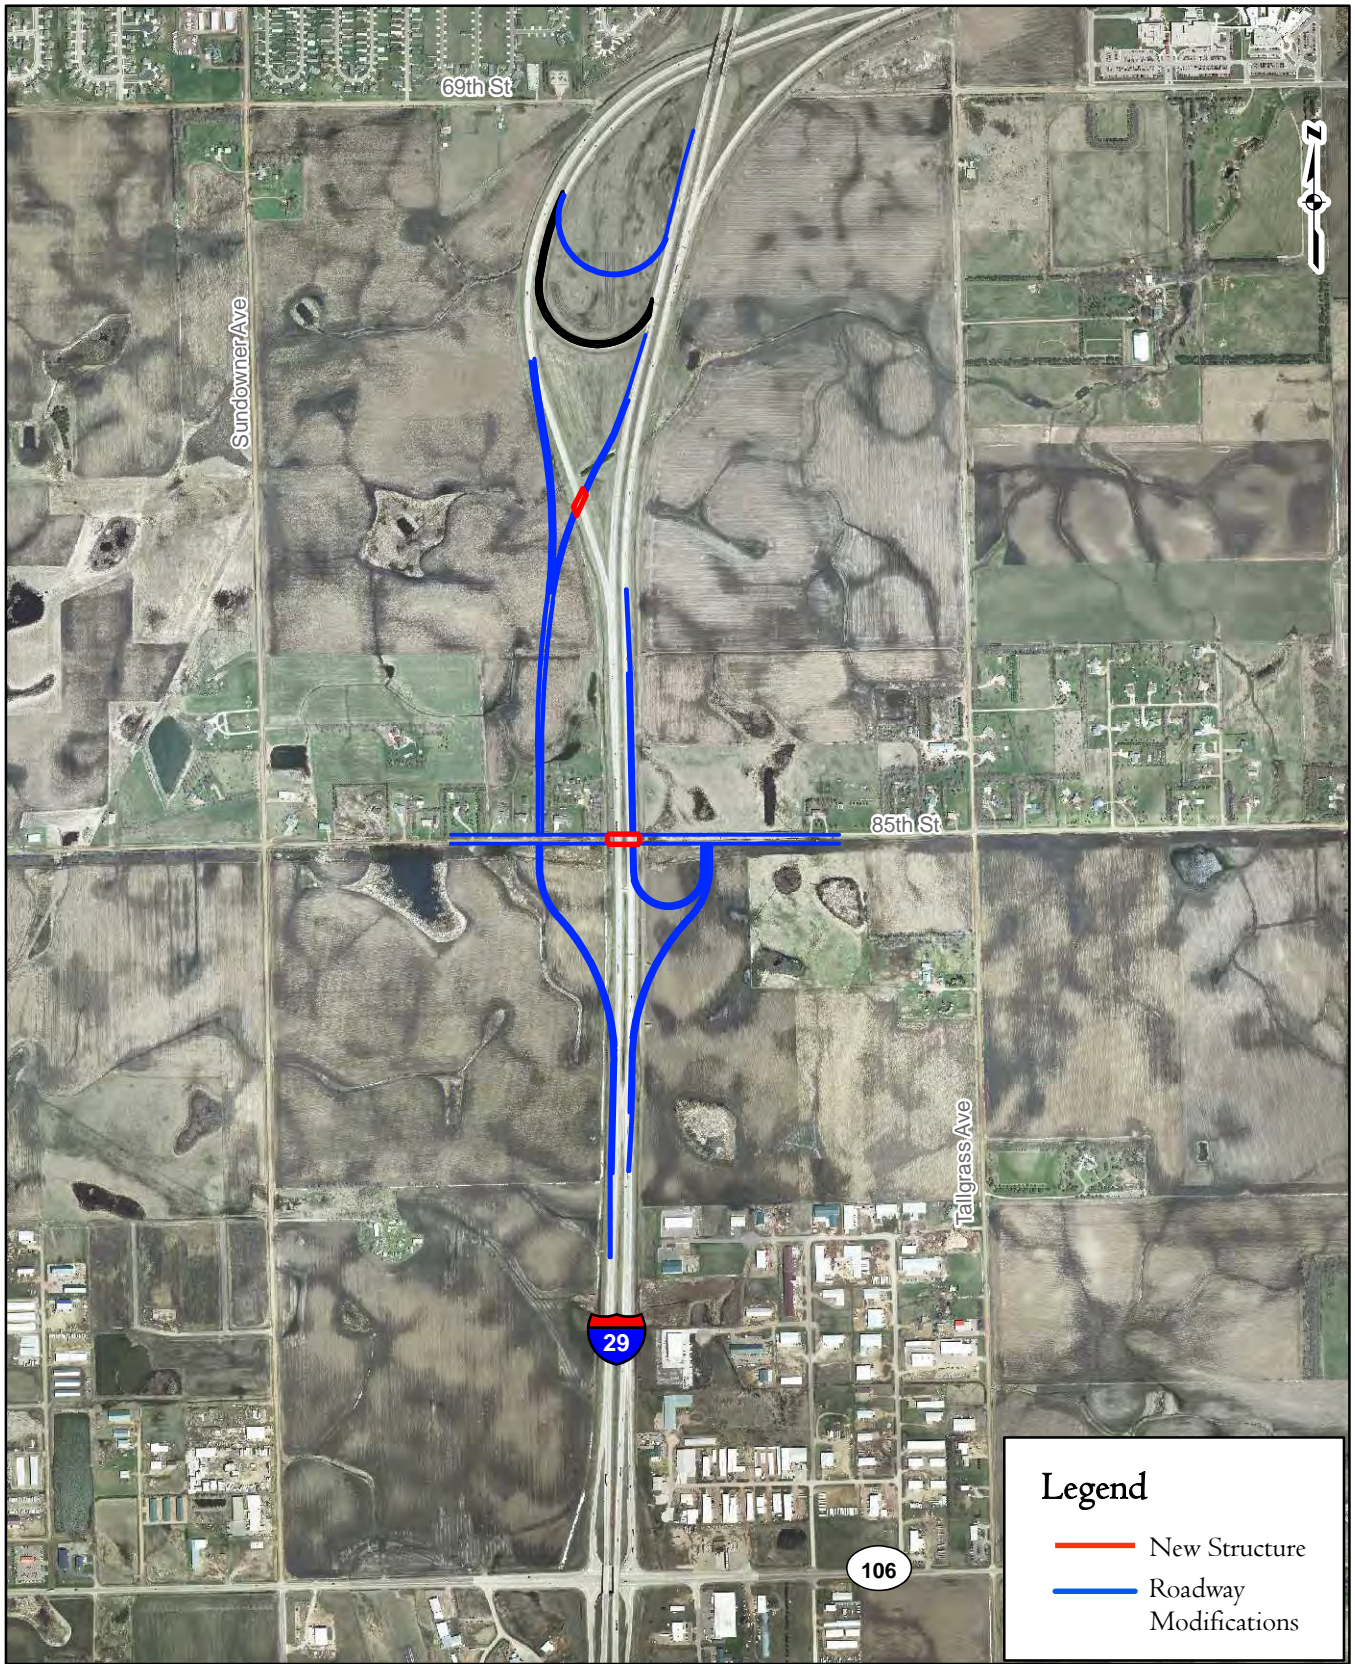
Alternative I2: I-29 / 85th Street Braided Southbound Ramps Interchange
